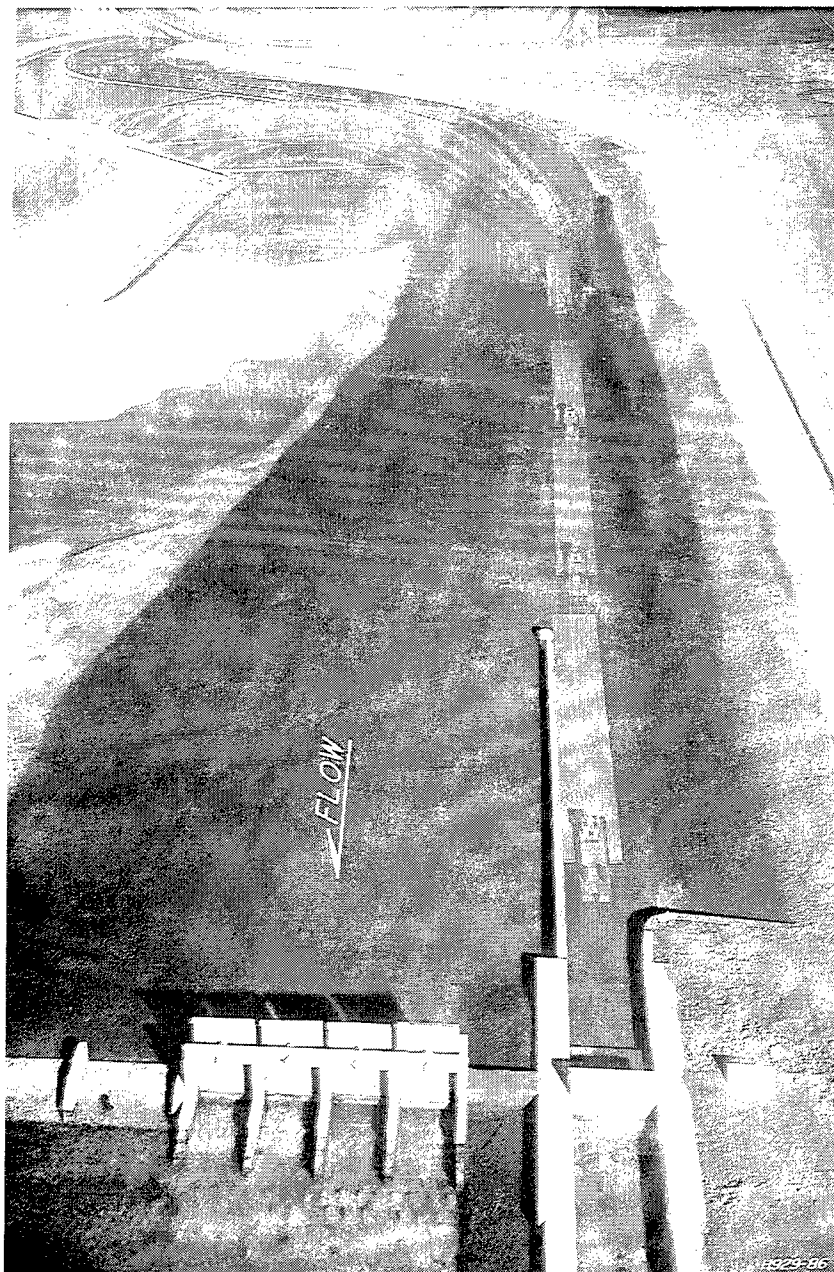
Plan C-2, looking upstream, discharge 60,000 cfs. Path of upbound tow leaving the upper lock approach
